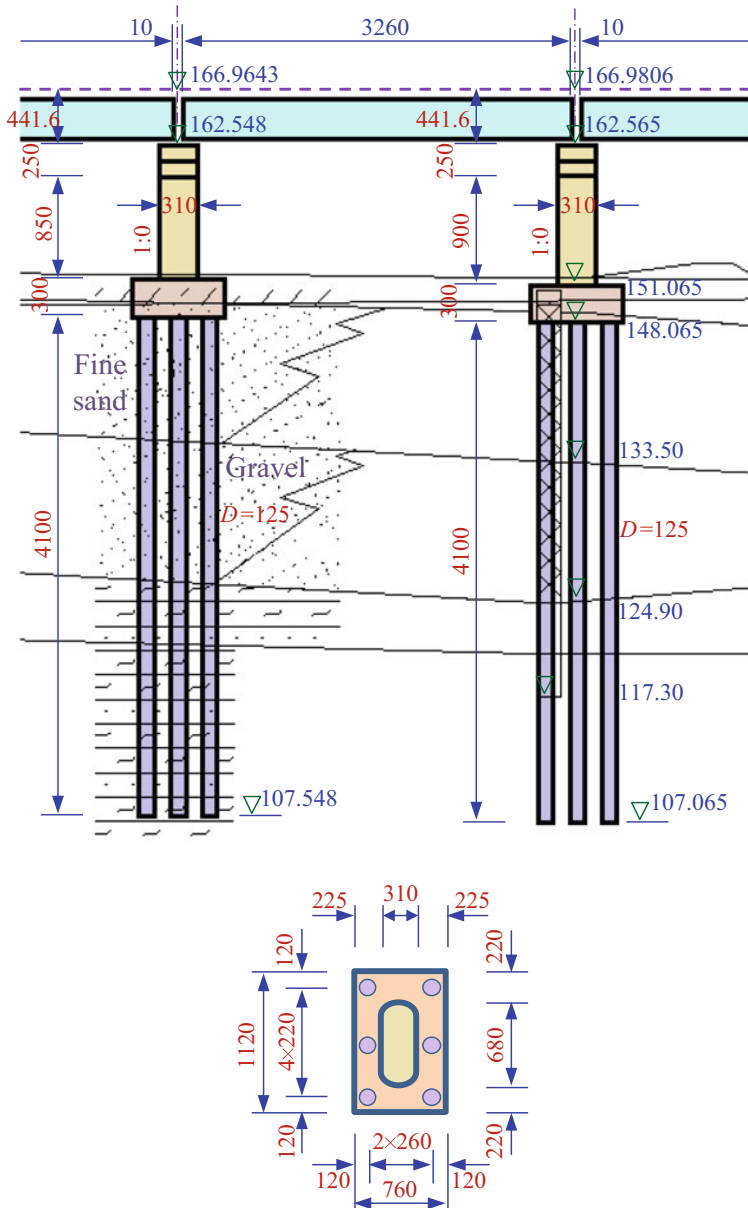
Layout and dimensions of group-piles foundation (Unit of elevation: m; unit of size: cm)
